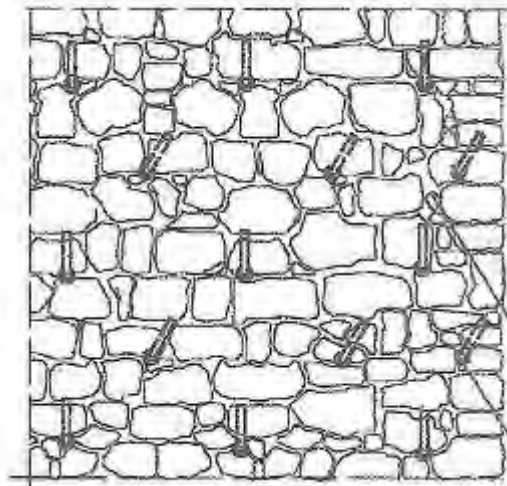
Scheme of a diffused injections in a masonry wall [7].
